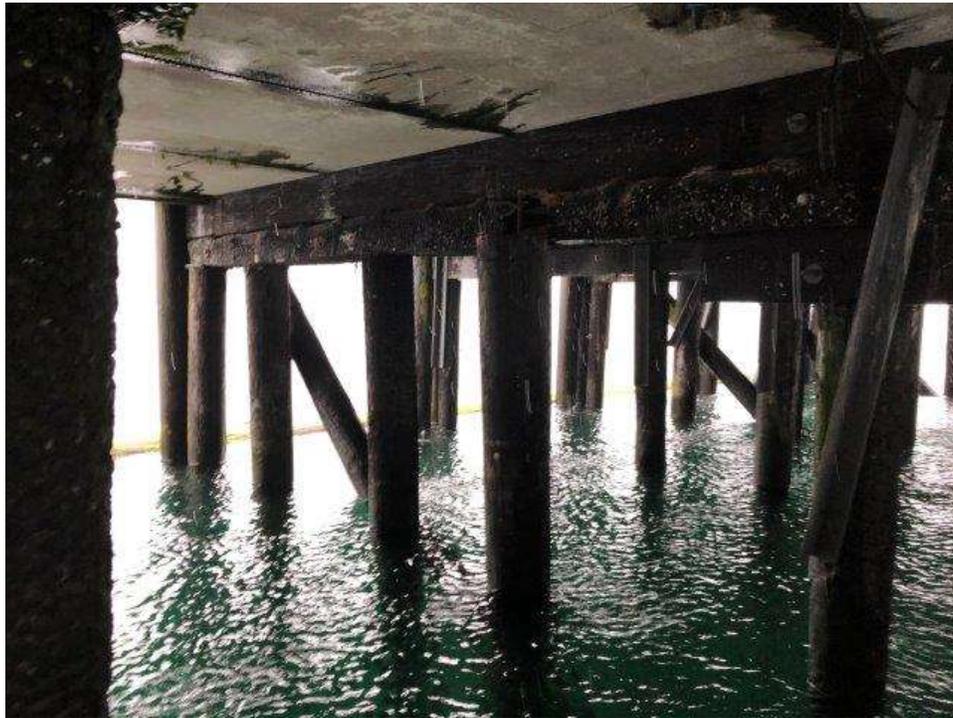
Wharhead Deck Panels With Spalling Adjacent to Drainage / Electrical Utility Holes
